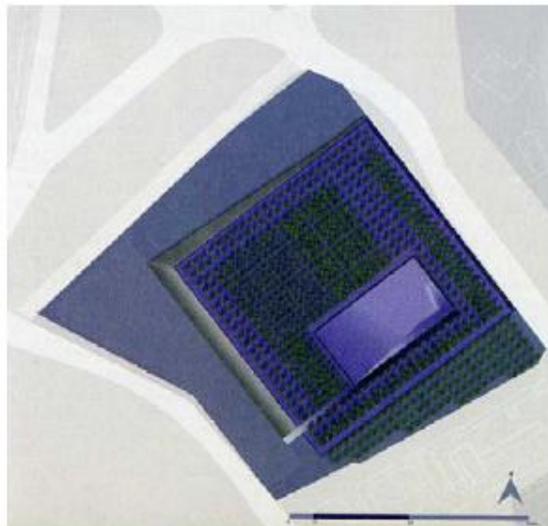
Plan (© CKPR/ Tsai-her Cheng, Taiwan)
